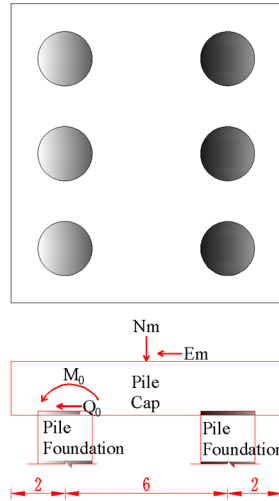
Load Transfer Mechanism between Transfer Beams and Pile Foundations
